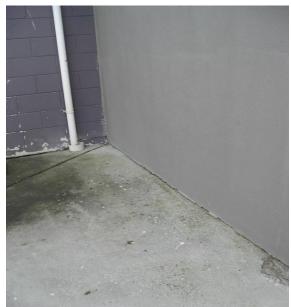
Gap opening up between Surf Club south wall and external ground slab.
